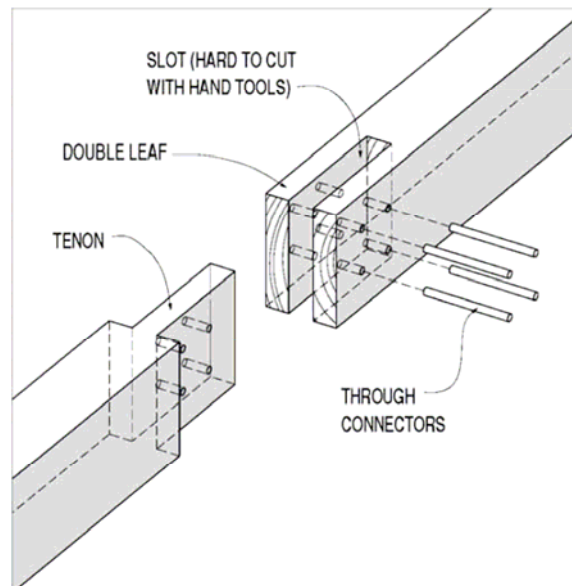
A double-leaf lap joint, with through connectors (Pierce et al. 2005)
